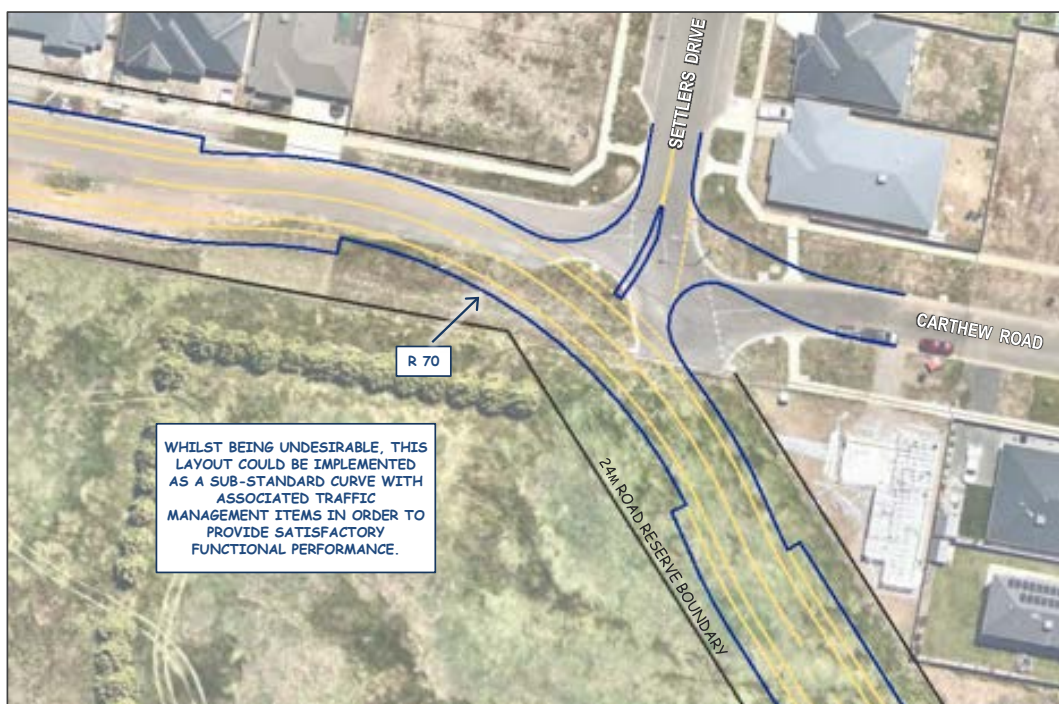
Potential Schreenans Road / Settlers Drive Intersection Layout within Current Land Provisions
